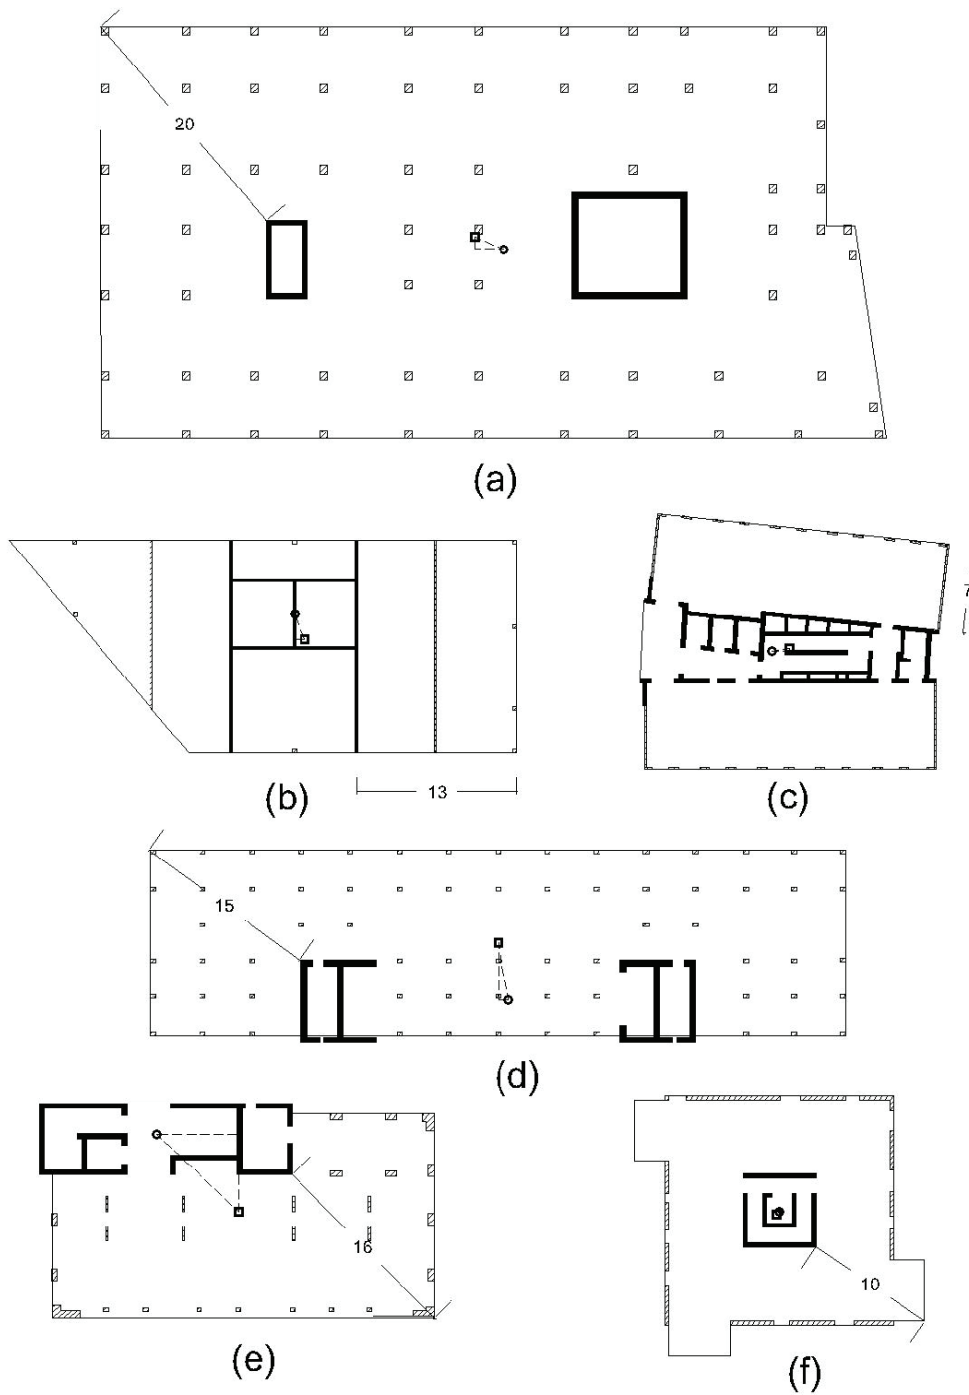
All six building plans with the distance Rigidity Center, Mass Center and D displayed.
